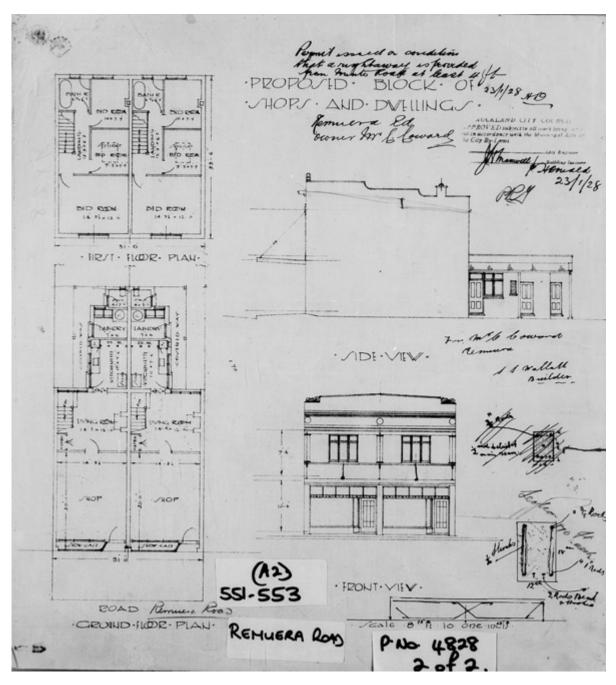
Architectural drawings of a block of two shops and dwellings proposed for Mr C. Coward, dated 1928. The architect is unknown (AKC 339 Building Permit and Consents Aperture Cards 1908-1908, Remuera Road (from 524), Record ID: 178632, Auckland Council Archives).
